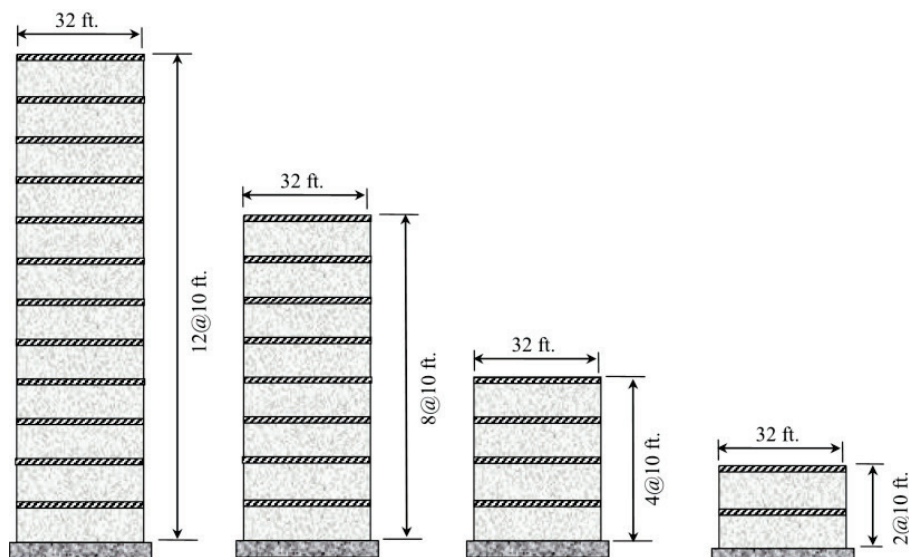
Reinforced masonry residential occupancy building from NIST GCR 10-917-8—elevation view.
